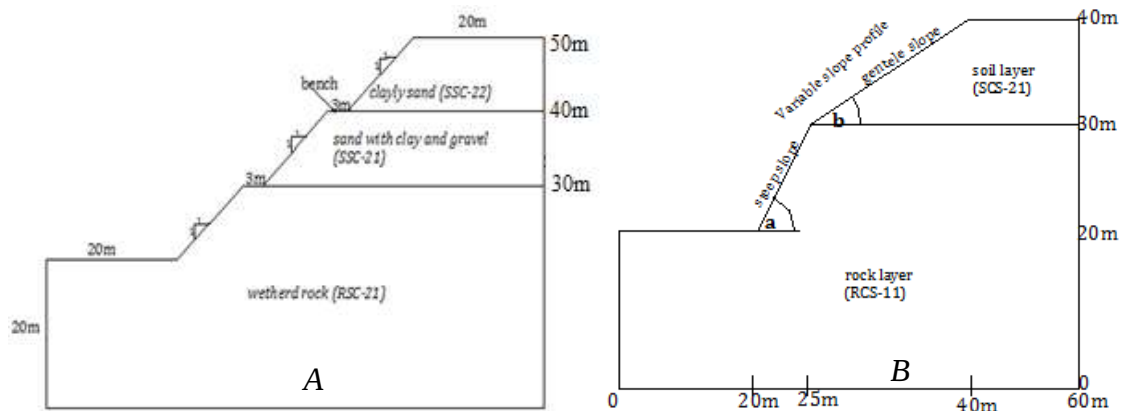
Typical cross-section of the road cut slope in the Goro to Abagada road project
